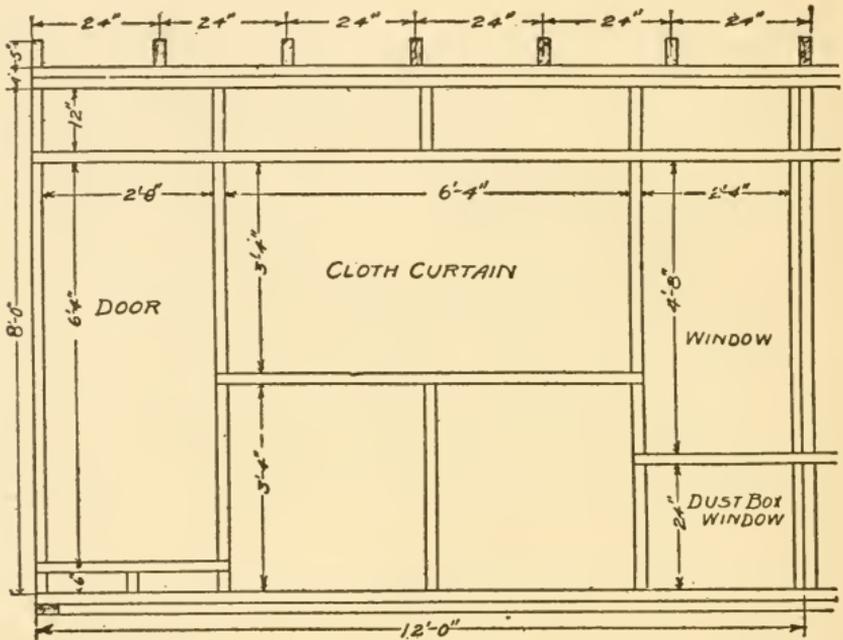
FRONT ELEVATION OF FRAMEWORK
